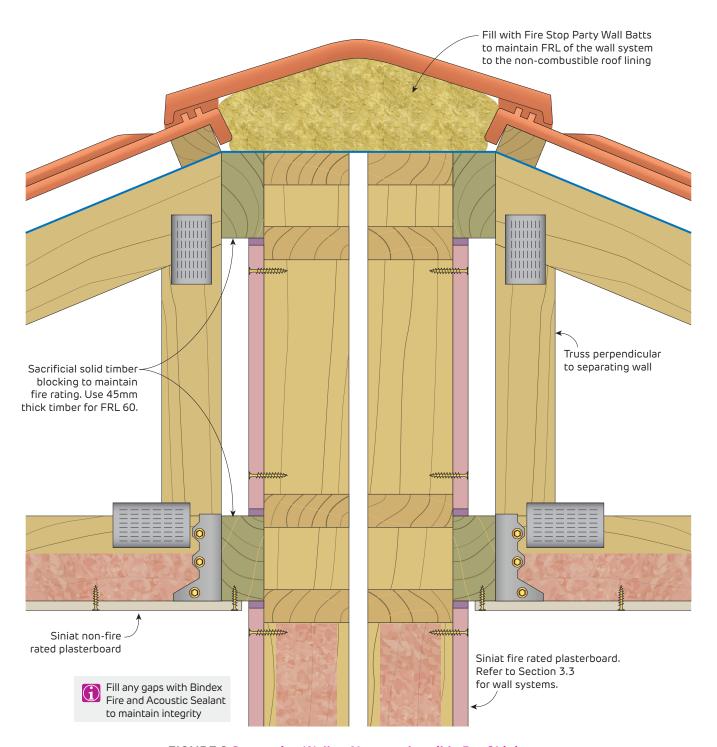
Separating Wall to Non-combustible Roof Lining FRL 60/60/60 Section
